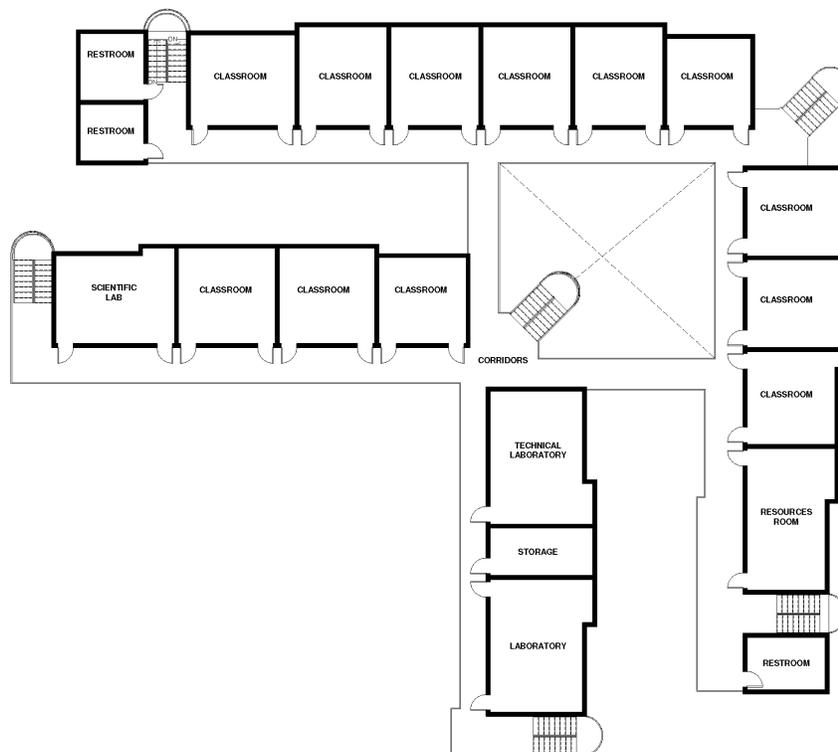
EJS typical floor plan - (Second, third and fourth). (Keshka, 2019) Digitally drawn by author.
